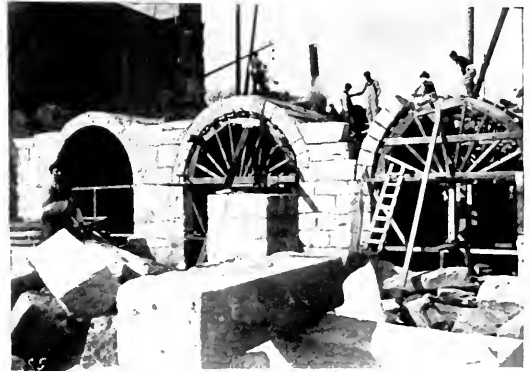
NEW FOUNDATION ARCHES FOR GARVIN'S FALLS POWER STATION.
